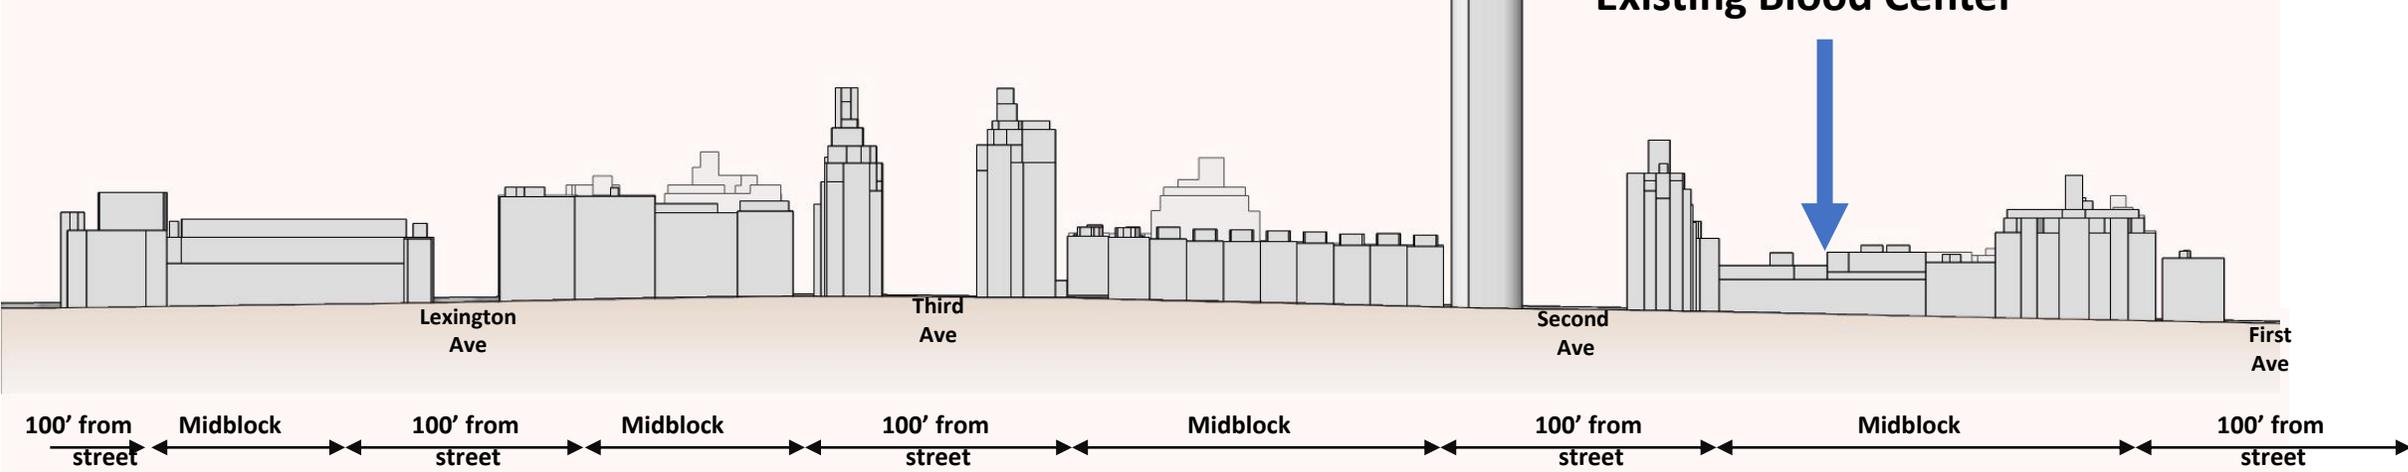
Exhibit B: Distribution of tall buildings on wide streets with lower scale on narrow streets
